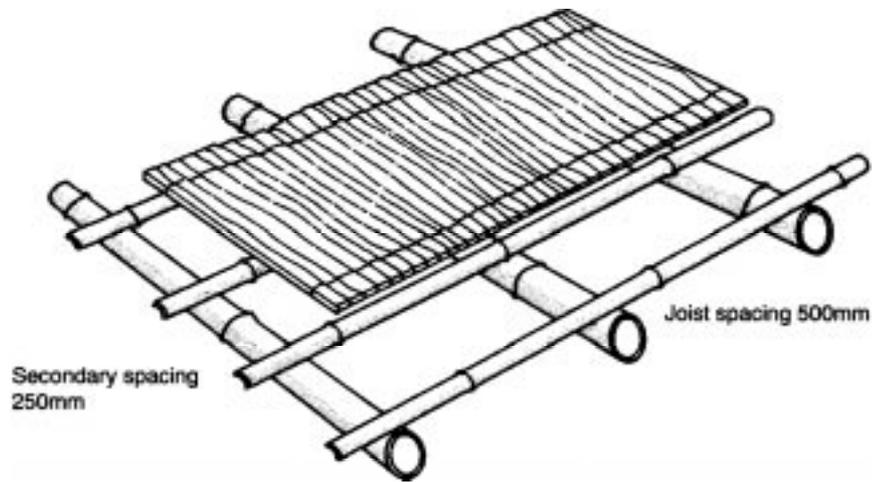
Joist arrangement - primaries and secondaries (after Siopongco et al. 1987)
